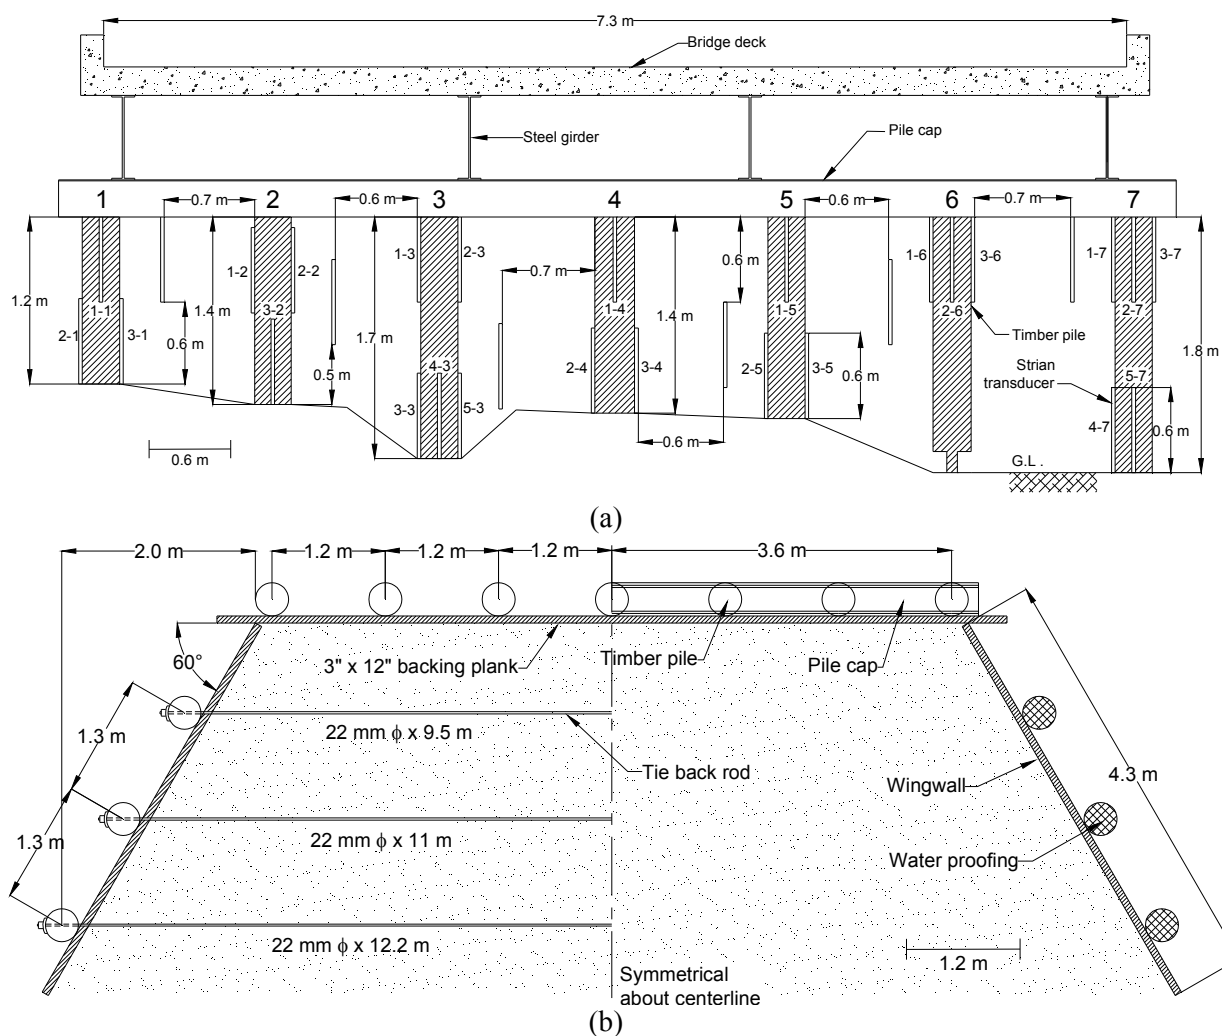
Schematic diagram of the east abutment (a) elevation view showing expose pile length and strain transducer locations (b) top view
